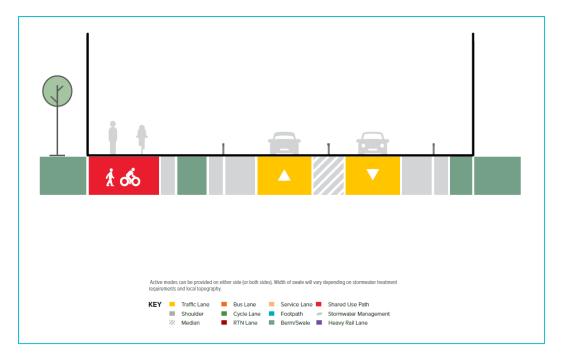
Generic 24m wide cross section is proposed with two lanes for general traffic and active transport facilities on one side of the southern side of the corridor. Proposed on Pukekohe East Road.
